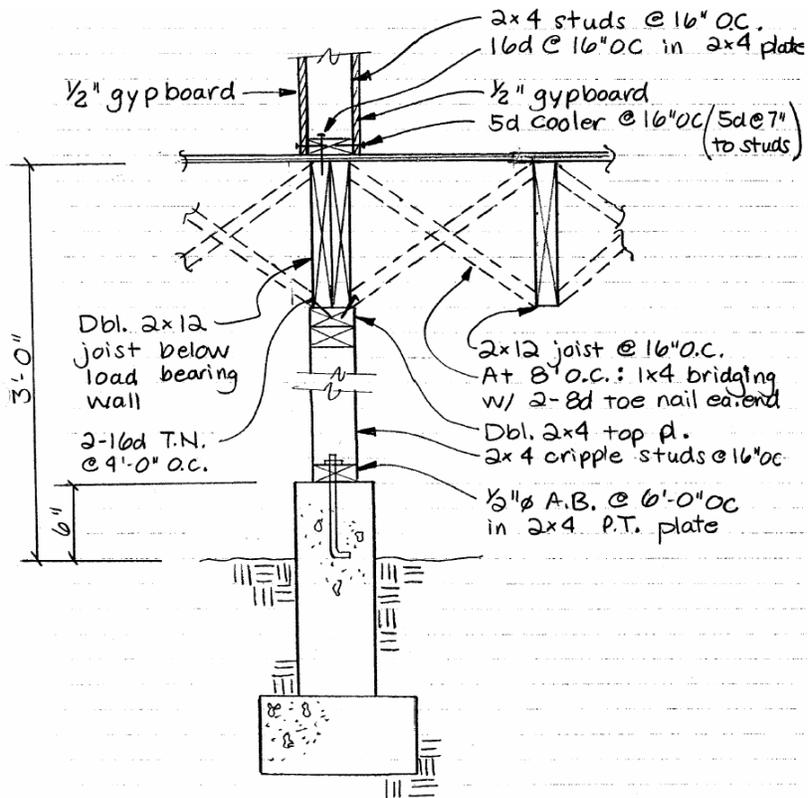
Interior cripple wall parallel to joists (detail 12-S2)
